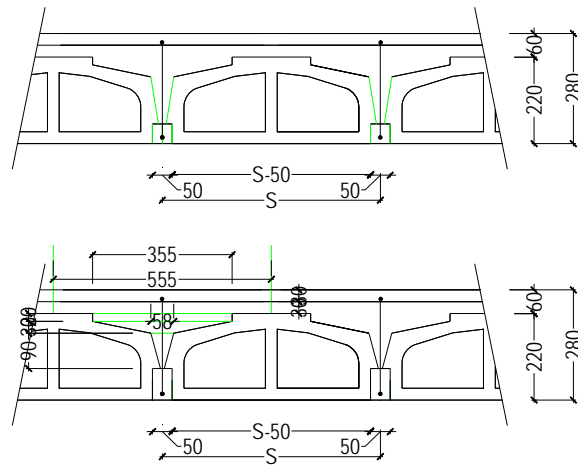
Plane truss model of precast beam and slab block arrangements
